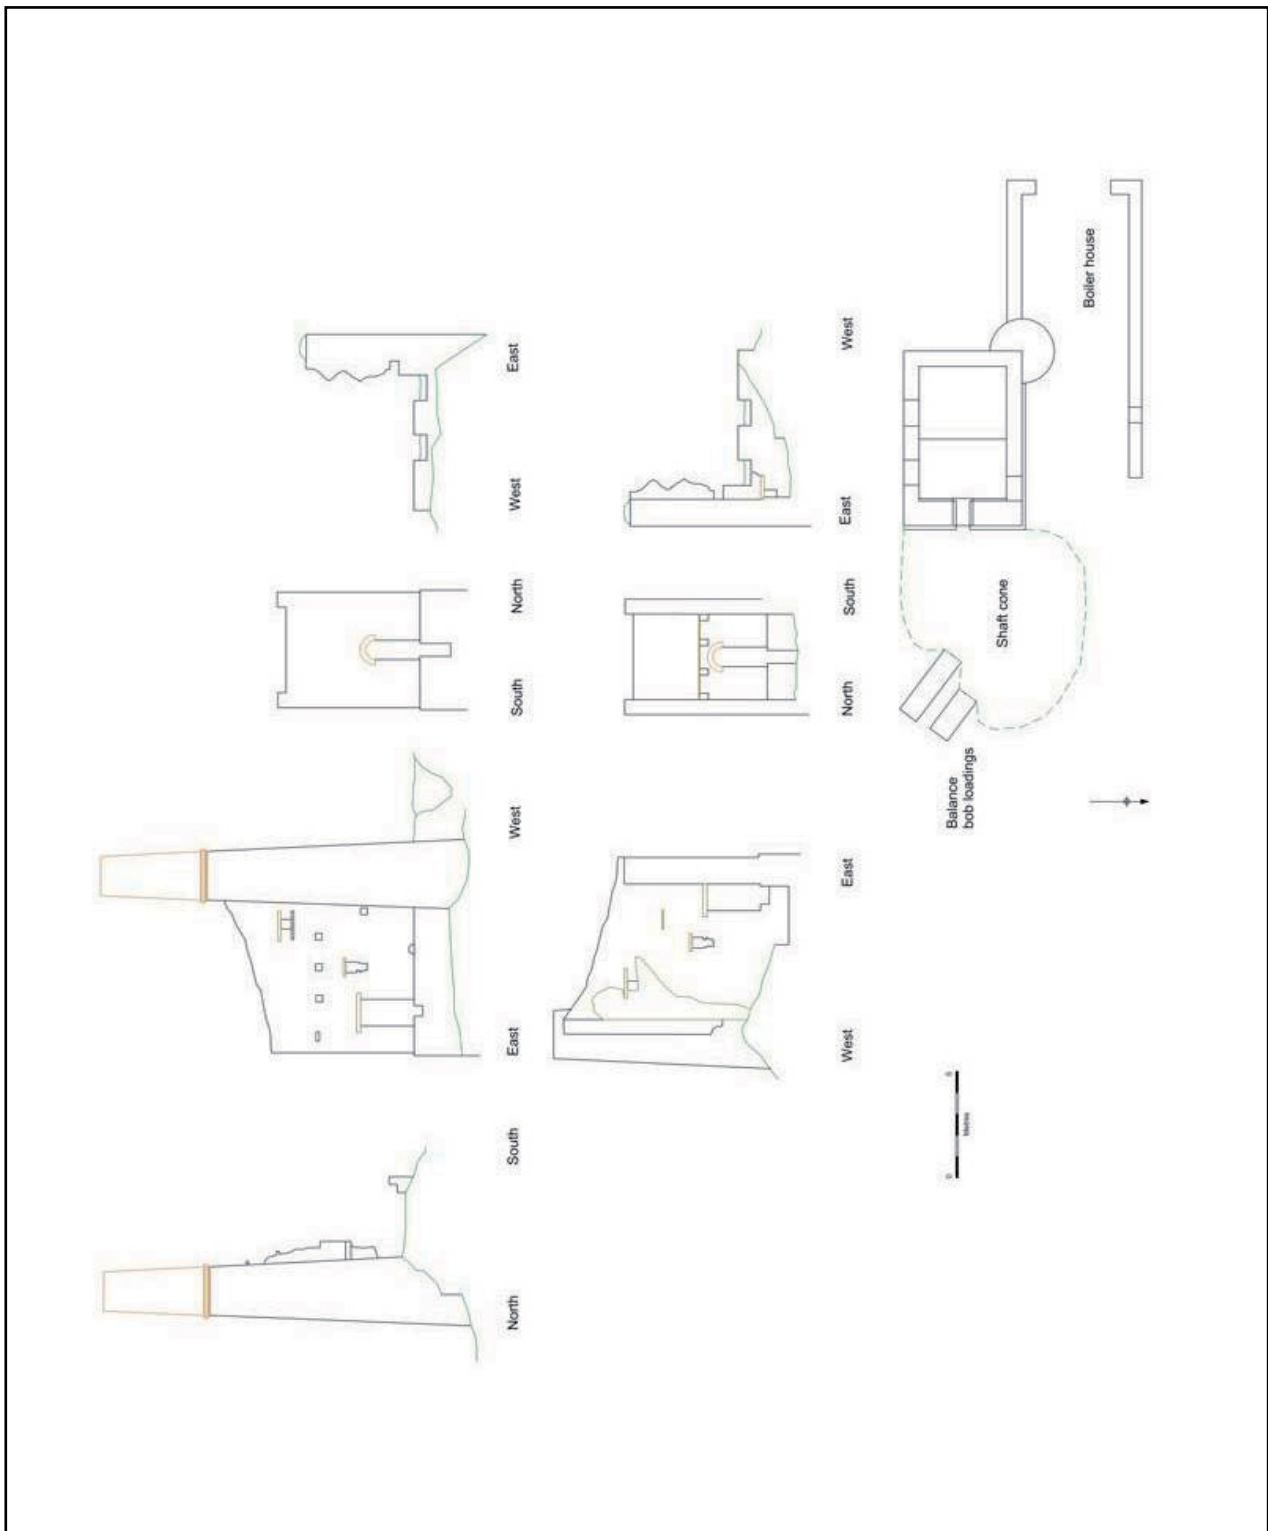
Plan, external and internal elevations of Charlotte United pumping engine house and boiler house [190616]/[190617], together with plan of shaft [190618] and balance bob mountings [190619].
